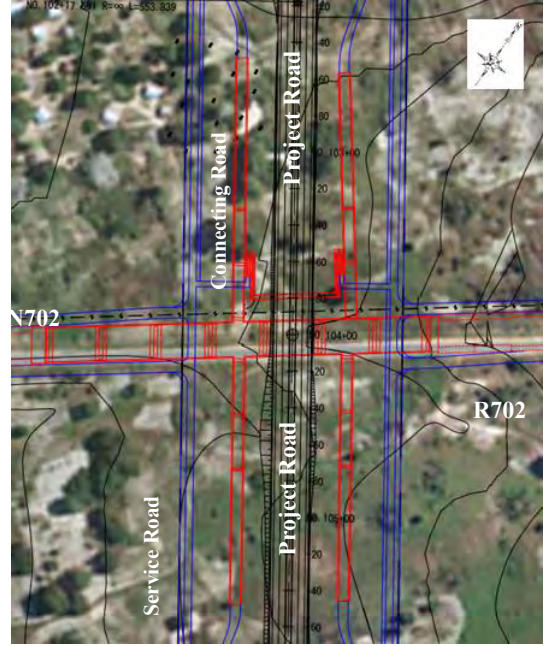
Traffic Lane Configuration at the Flyover Bridge for connecting with N1 and Bypass Road
